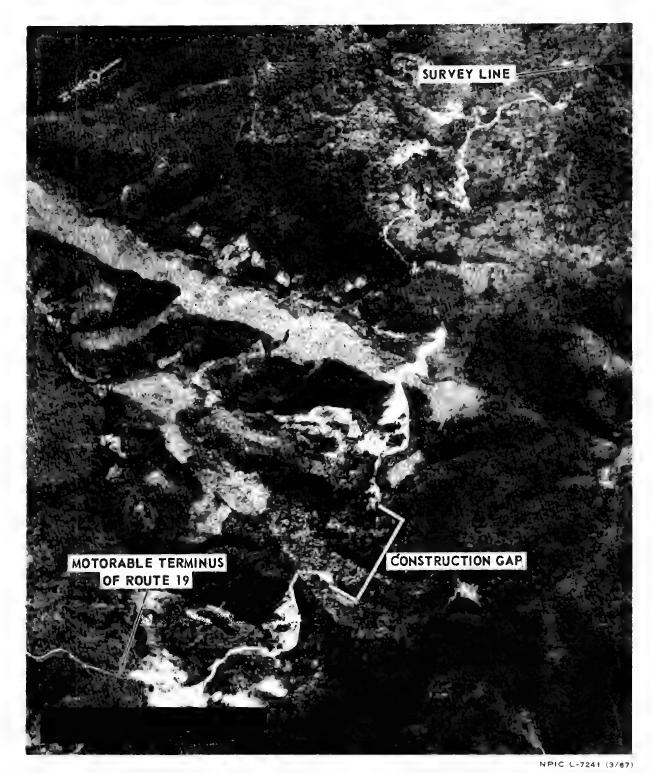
ROAD CONSTRUCTION, ROUTE 19, LAOS
